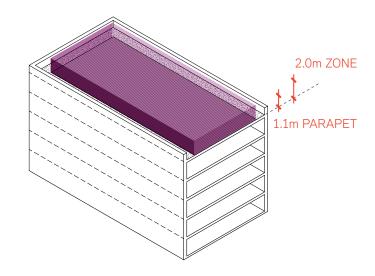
ROOFTOP PLANT ZONE HEIGHT
